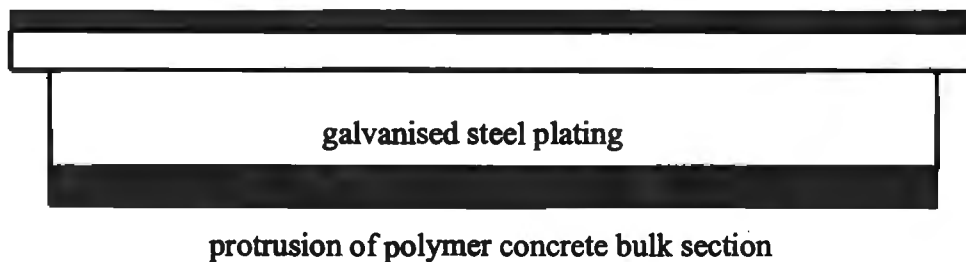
Polymer concrete manhole moulding with galvanised steel surface reinforcement.
